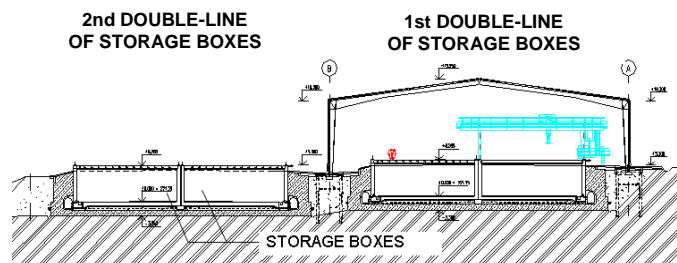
Typical cross section of the 1st and 2nd double-line of storage boxes
